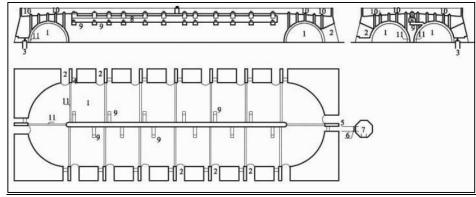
Split Hoffman Type Brick Kiln Plan [25] - 1. Cooking section, 2. Door, 3. Flue hole chamber, 4. Flue hole cover, 5. Main smoke chimney, 6. Chimney cover, 7. Chimney, 8. Hot air duct, 9. Chimney ducts leading to the compartments, 10. Feeding holes, 11. Flat arch
